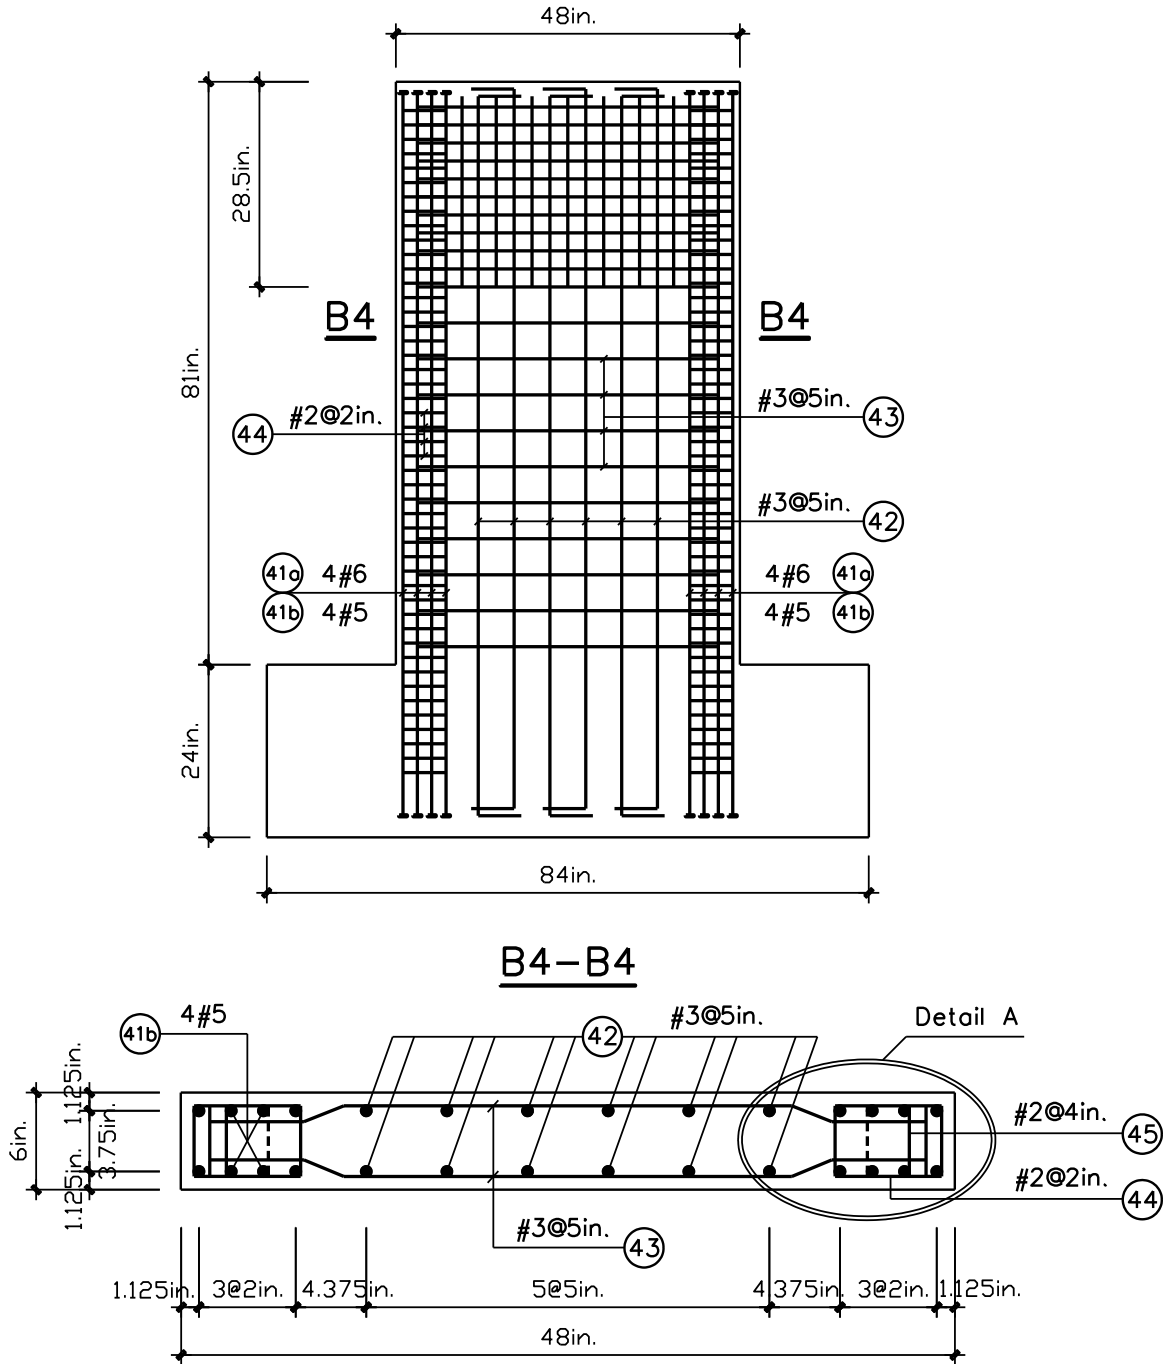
Reinforcement details for RW-A15-P10-S78
